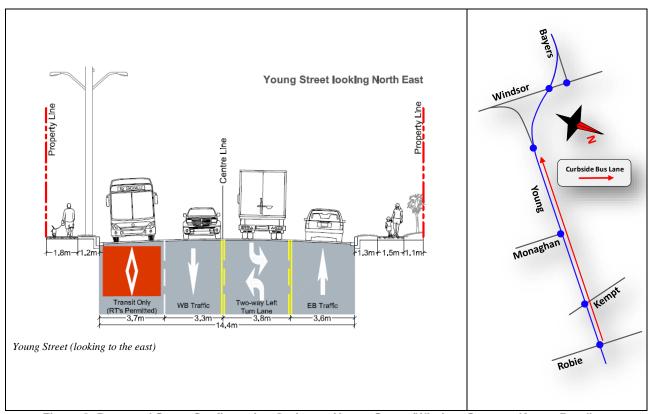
Proposed Street Configuration Options – Young Street (Windsor Street to Kempt Road)
